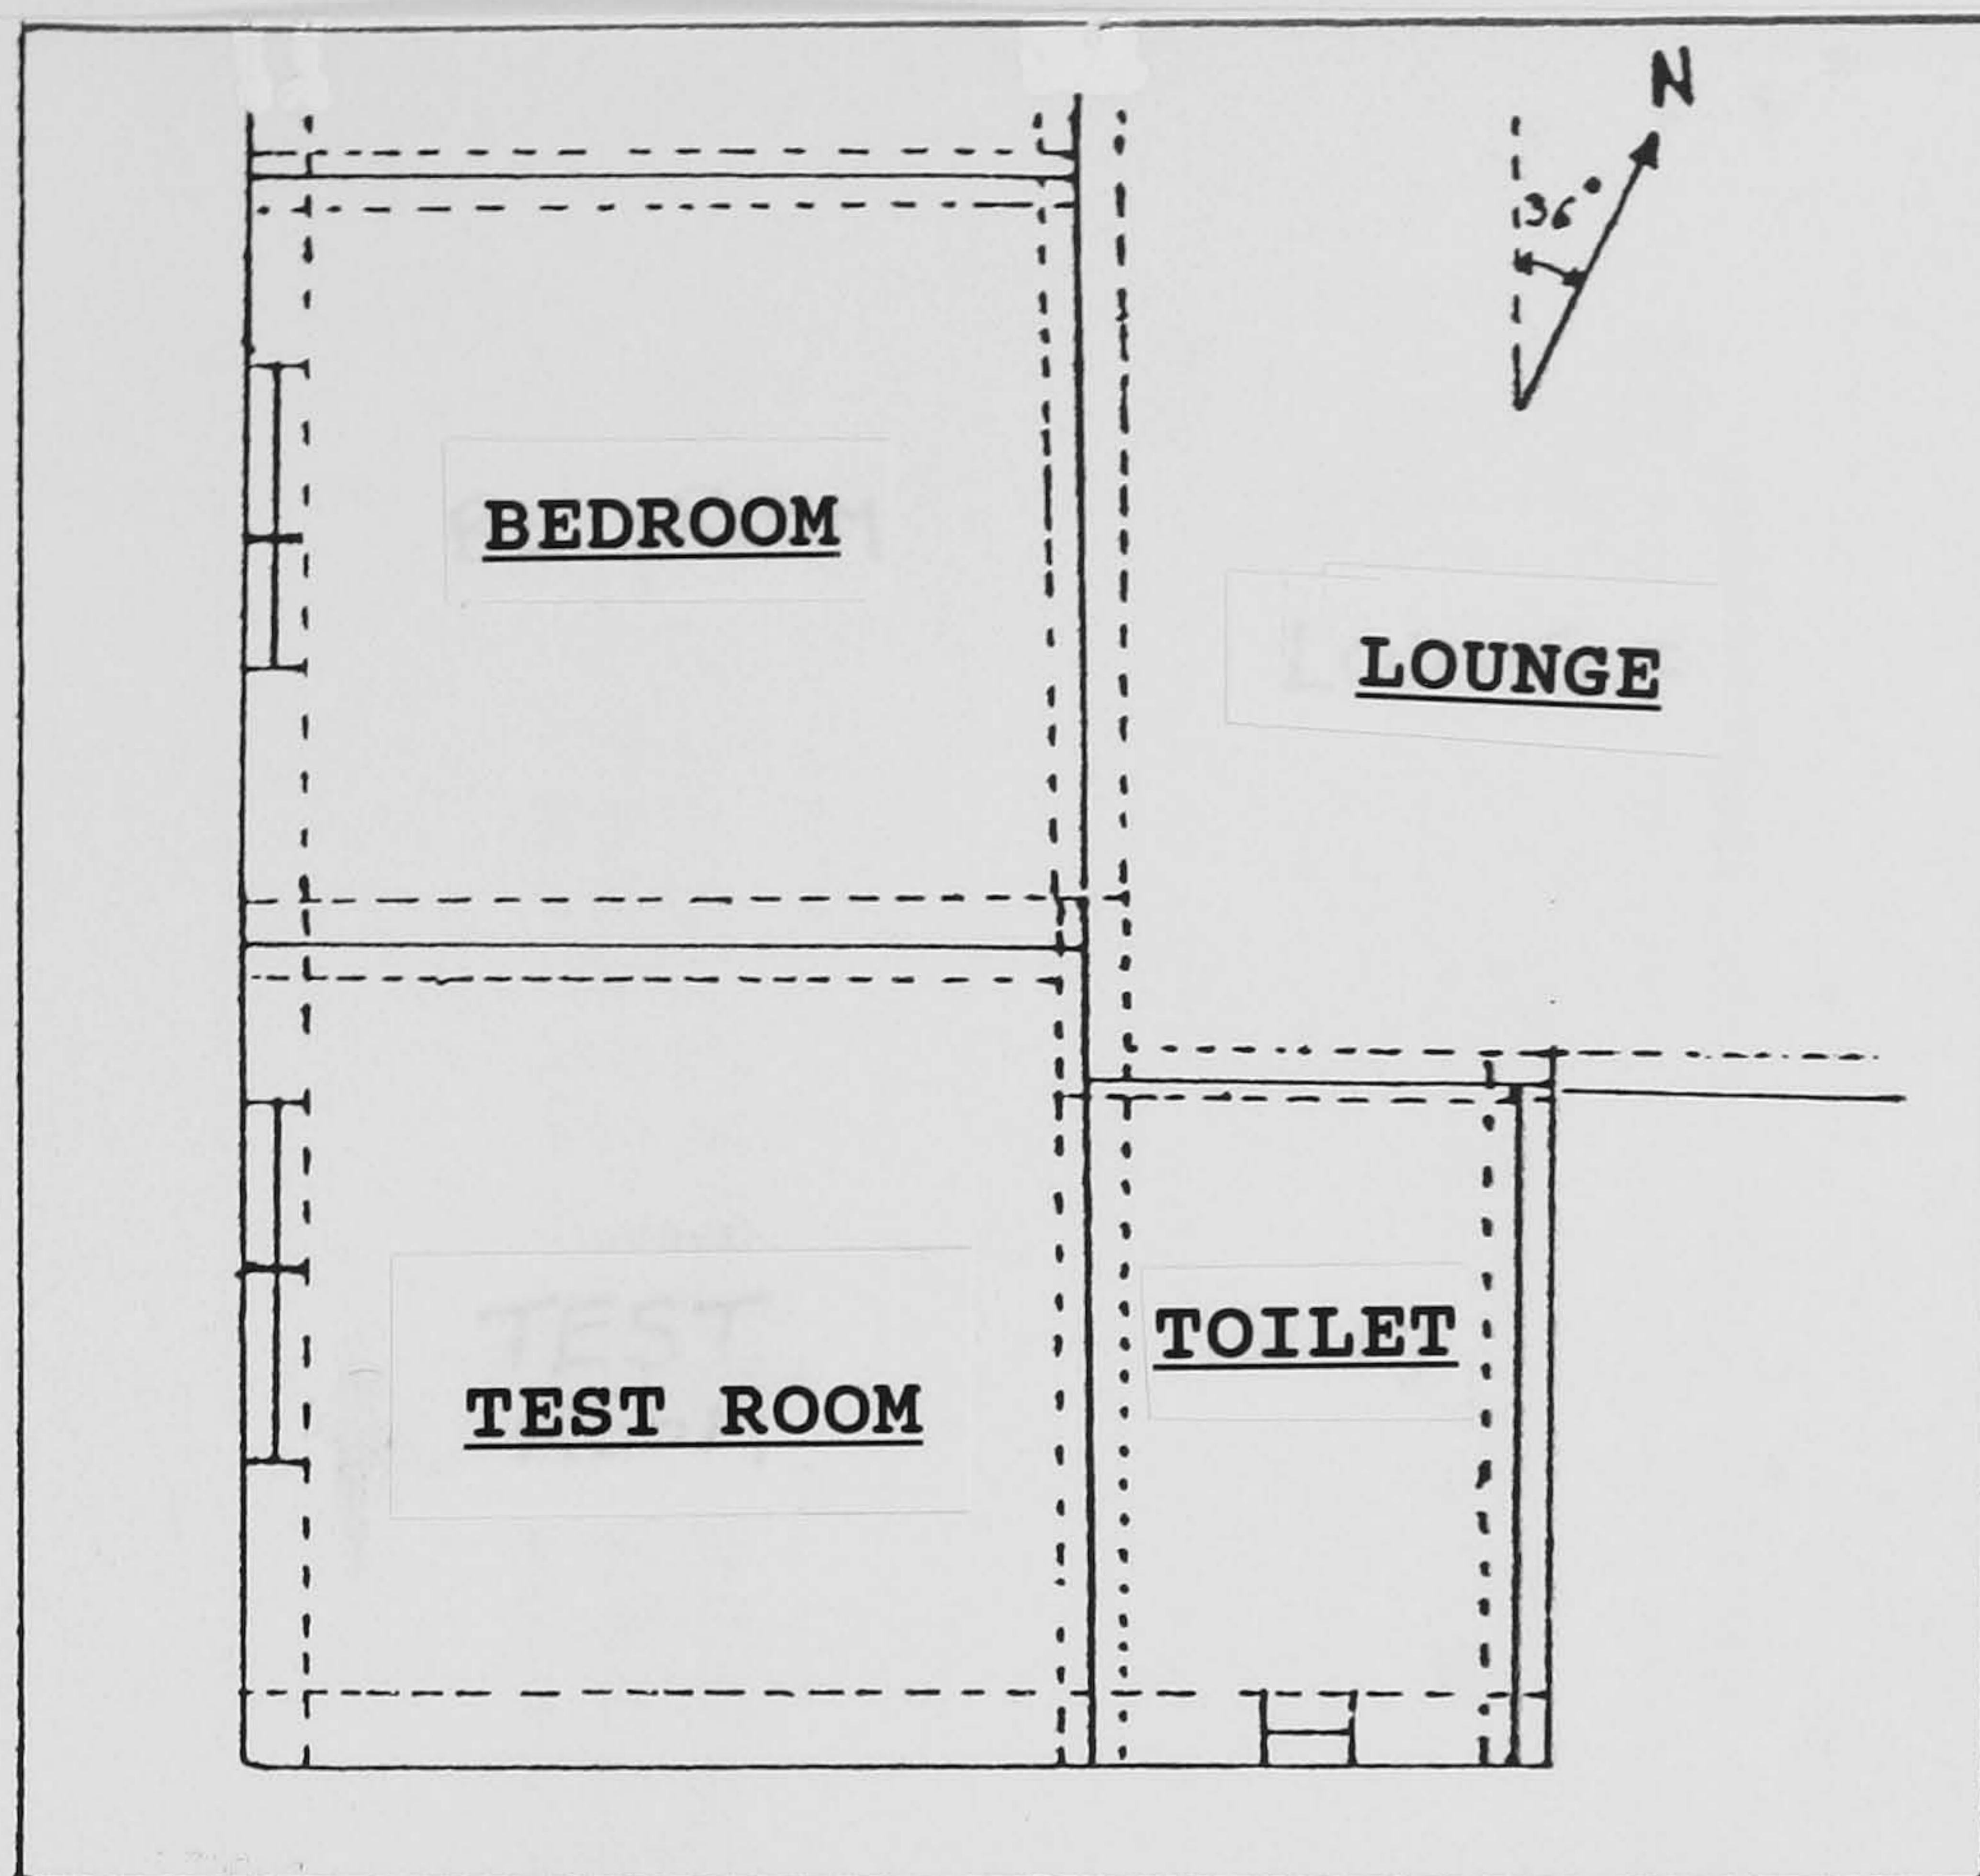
The lay out of the room used to validate the single-room model, with insulated roof and double-leaf insulated cavity brick walls.
